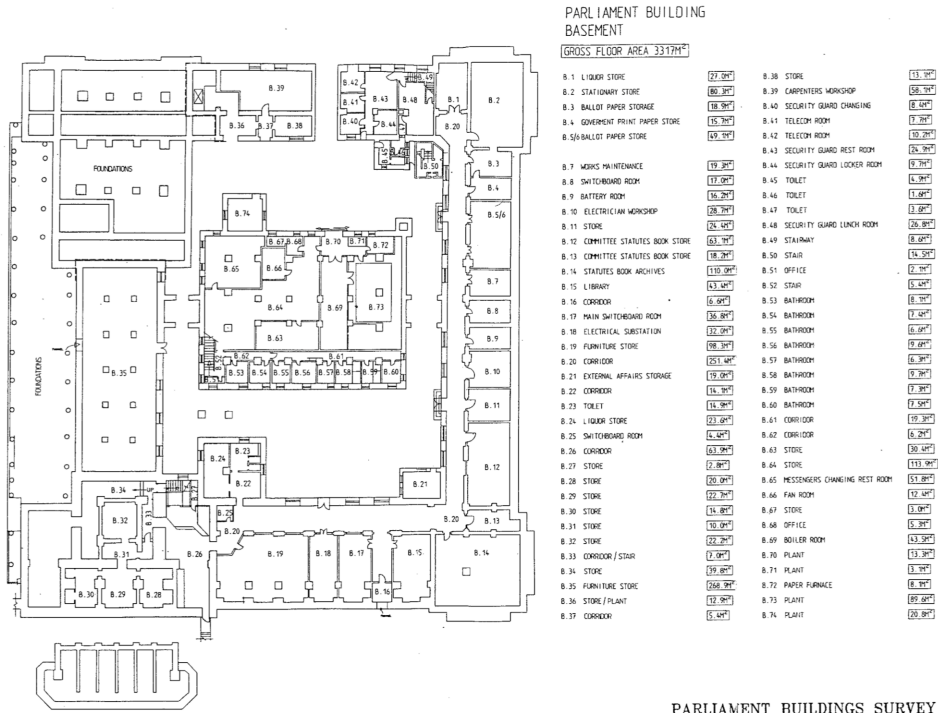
Basement floor plan, Works Consultancy drawing, 1988
